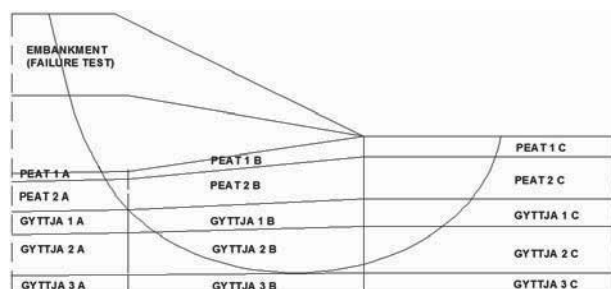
Division of organic subsoil into shear zones for the failure test at the Antony site.
